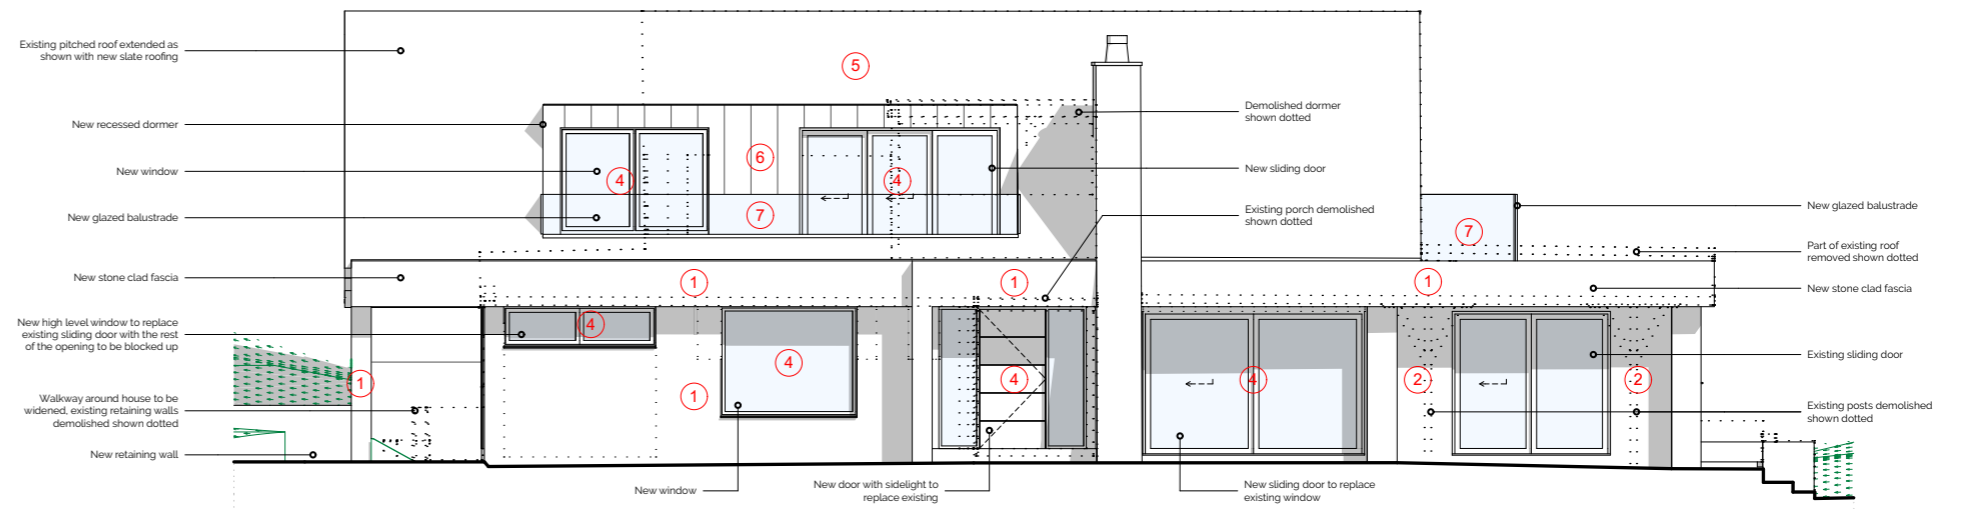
71 Leeson Road Proposed South Elevation - Not to Scale
